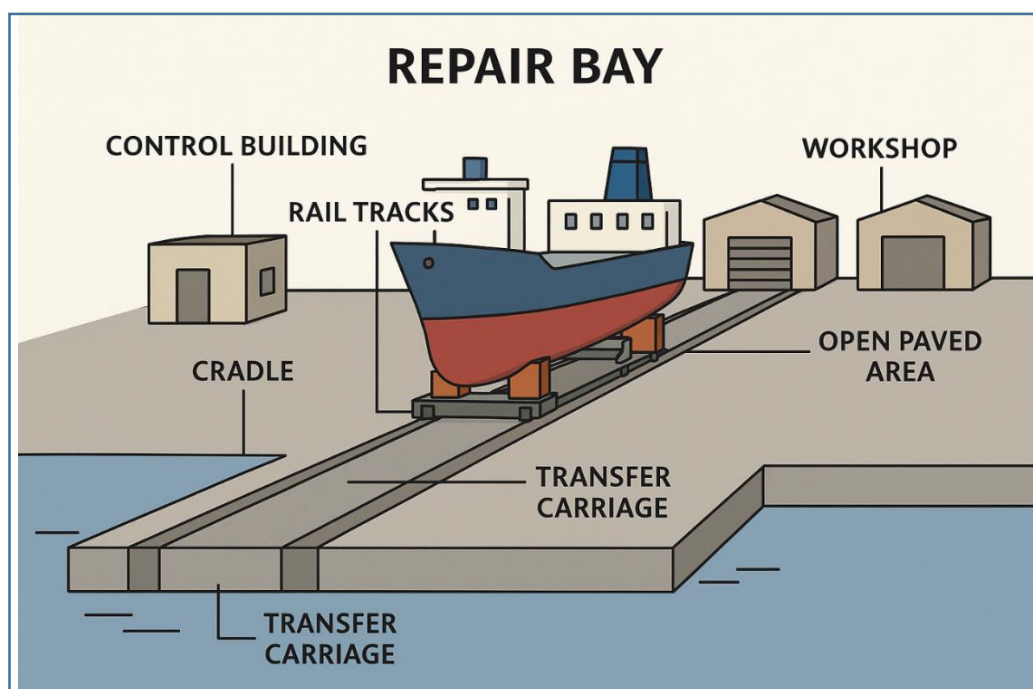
4 Typical Repair Bay in Ship Repair Facility
